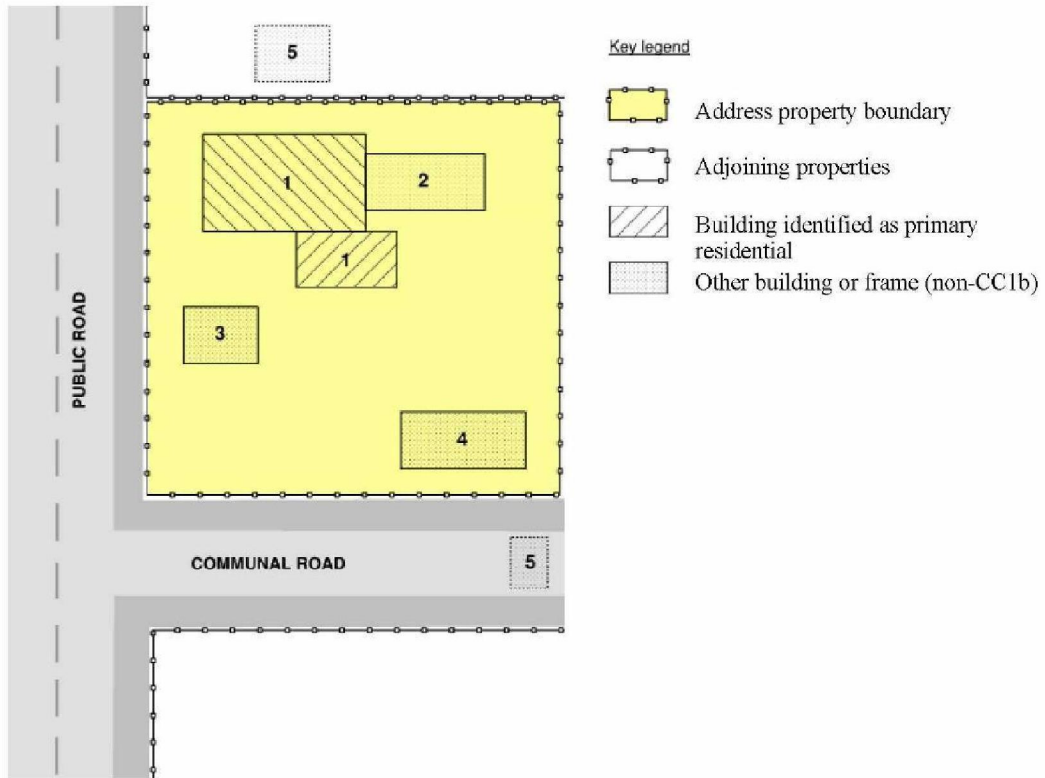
Indicative plan sketch showing scope of work within or outside the property boundaries.
